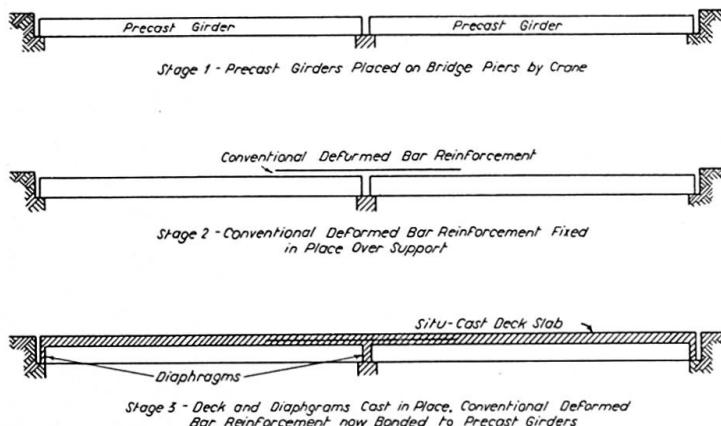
Sequence of Construction of Continuous Precast Bridge.
